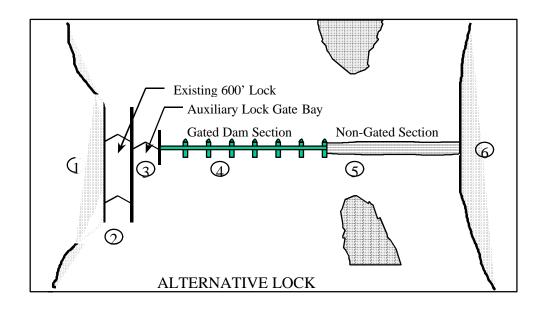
Alternative New Lock Locations at a Typical Existing Lock and Dam Site.
